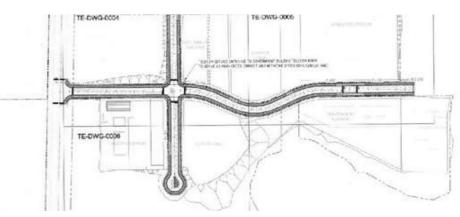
Phase 1A As-Built Underground Telecom Lines Layout Source: NGAC Construction Supervision Team
